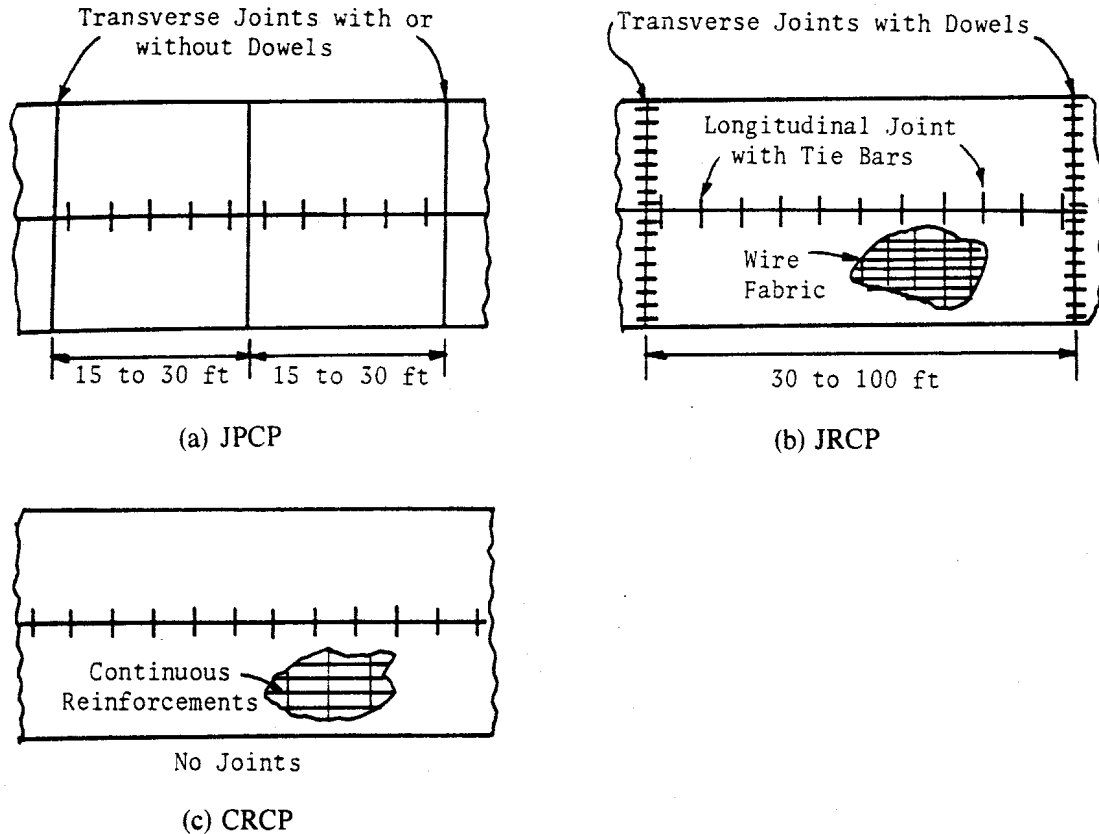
Common rigid pavement types.⁽¹⁾
